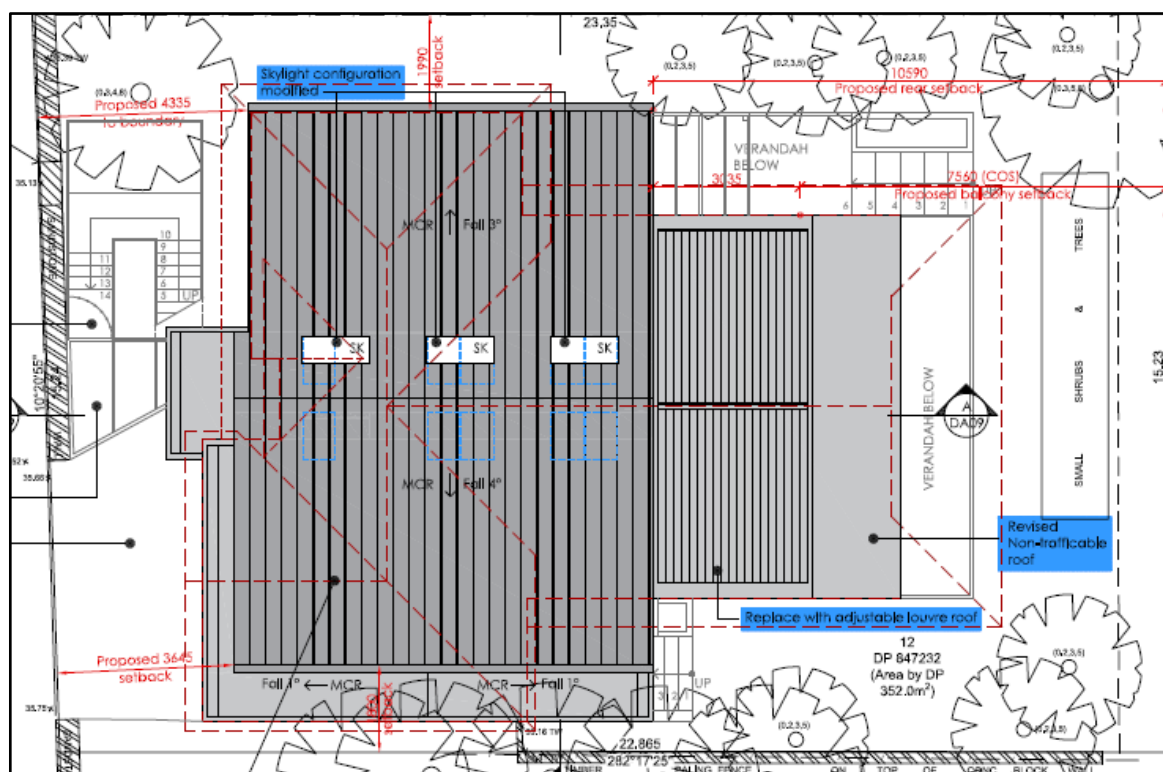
Proposed site and roof plan (Source: Edifice Design 2021, DA/637/2019/B)
